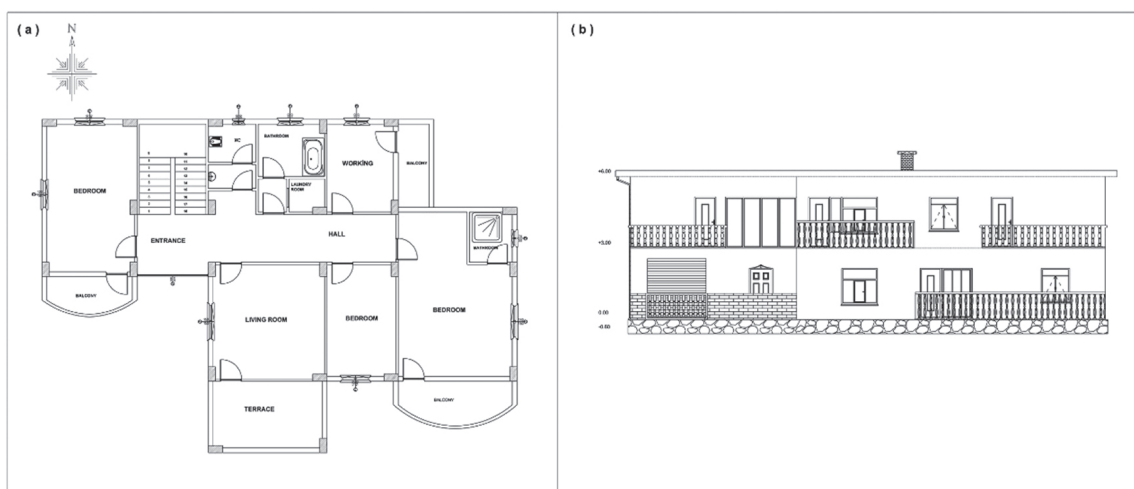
First floor plan (a) and south elevation (b) of the single-family house building.
